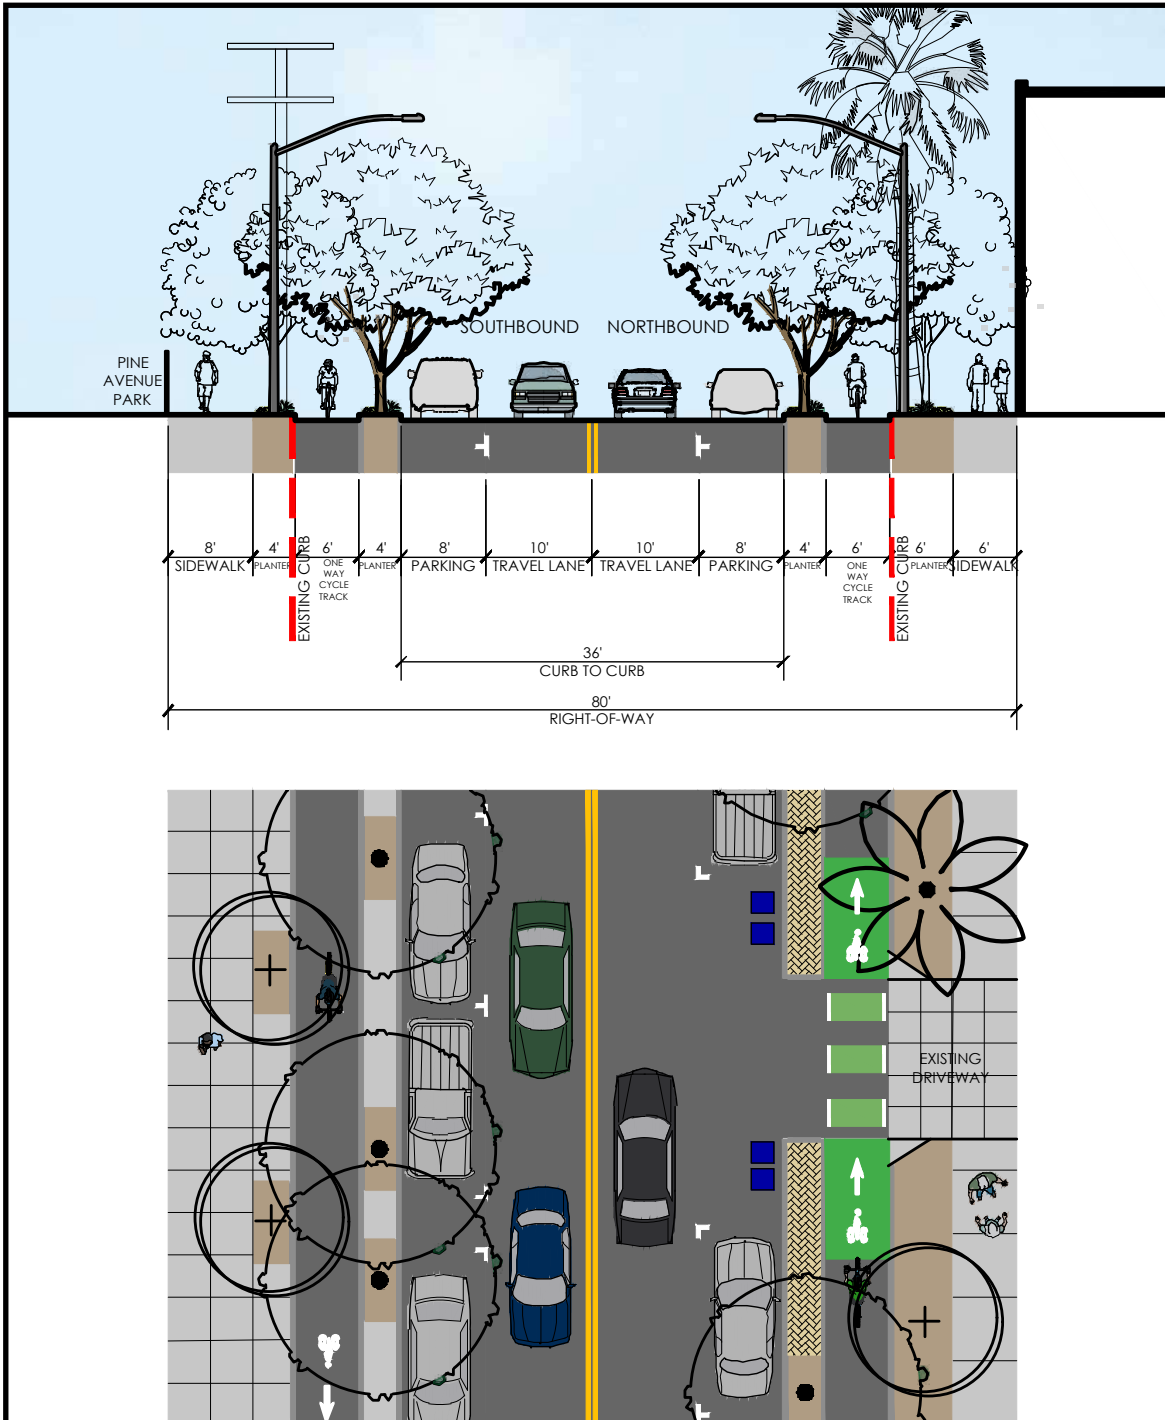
, Harding Street: Proposed Conditions B (North of Pine Avenue)
